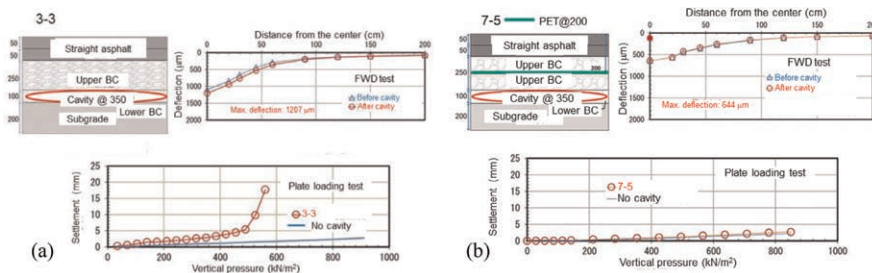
Loading tests on the cavities at 350 mm. (a) 3-3 (No reinforcement). (b) 7-5 (PET at 200 mm).
